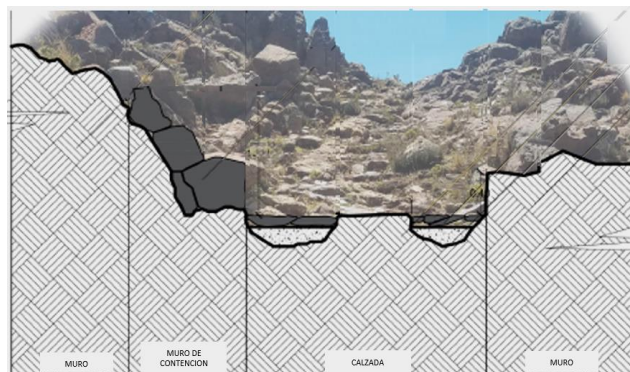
Road Section with retaining wall. Source: ATLAS Consulting Project - Adjustment Annex 18-2019.
